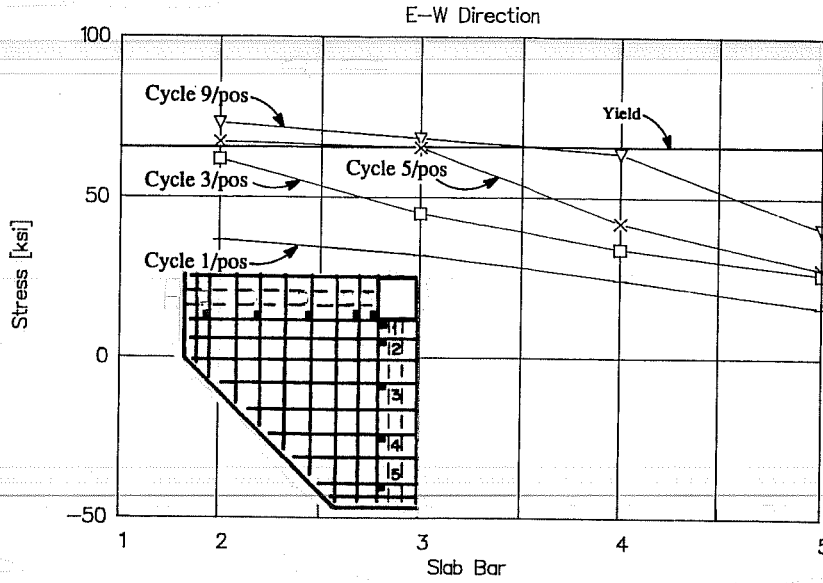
Specimen SD-B - Stresses Across E-W Top Slab Bars
